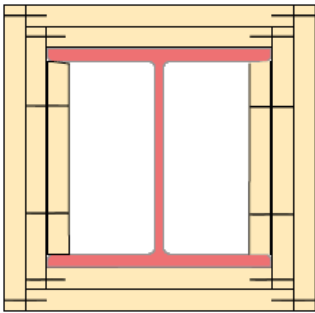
Plan view of Universal Steel Column with installed double layer Knauf Fireboard
